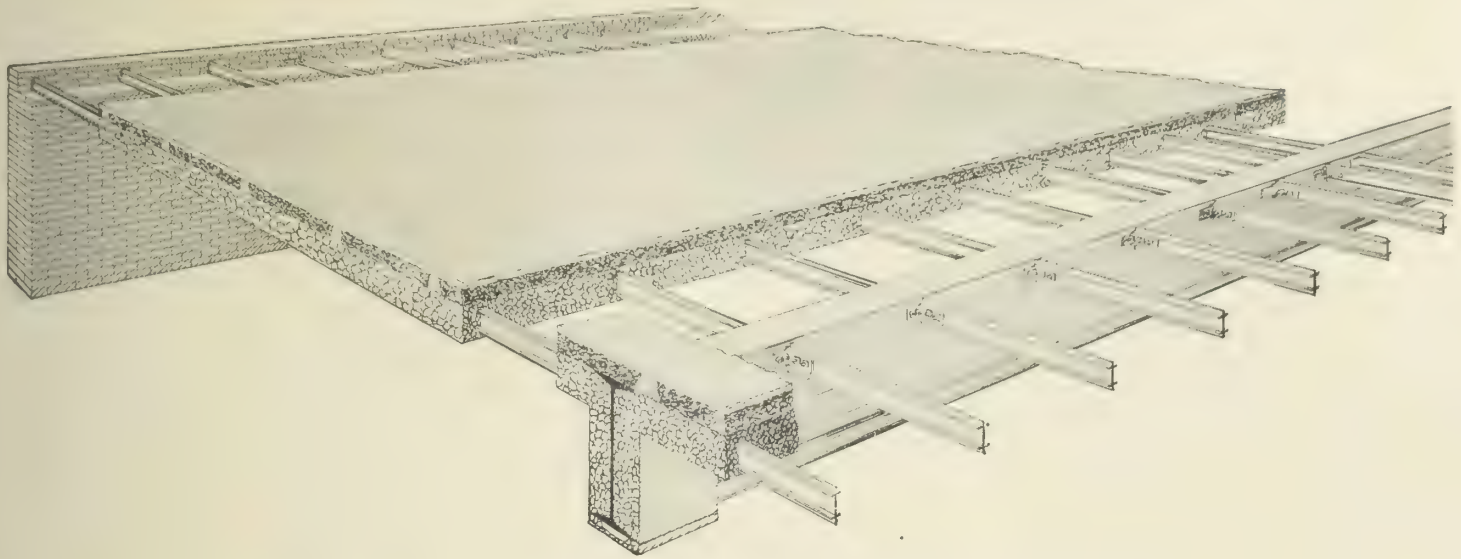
VIEW OF FLOOR WITH HEAVY BARS FRAMED TO GIRDERS
